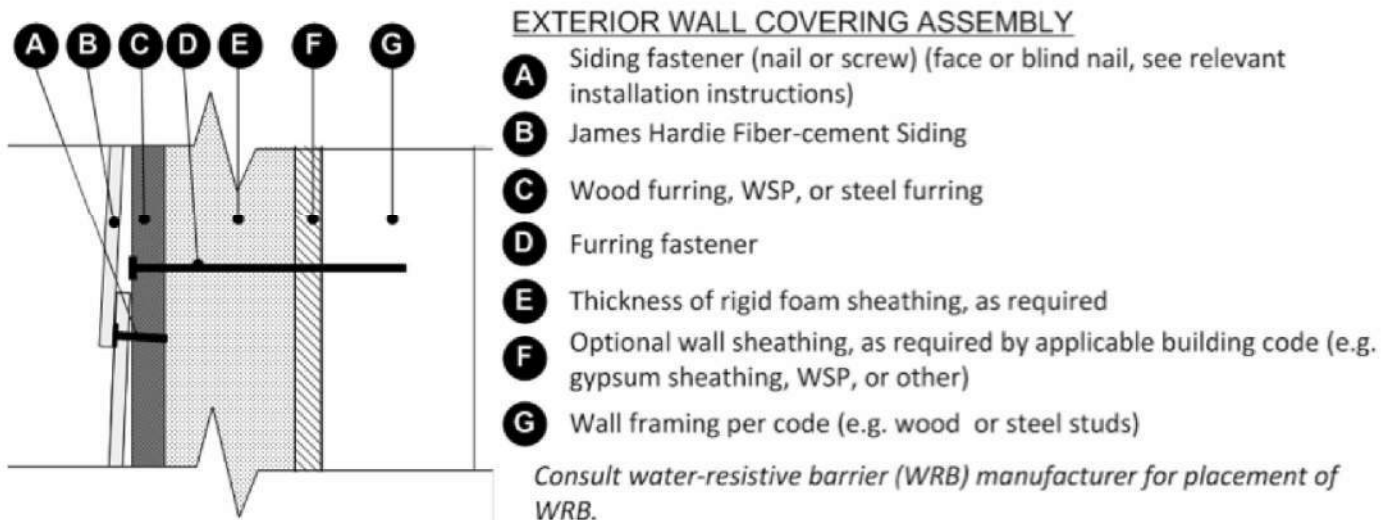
Exterior Wall Assembly for Siding applied to Furring
